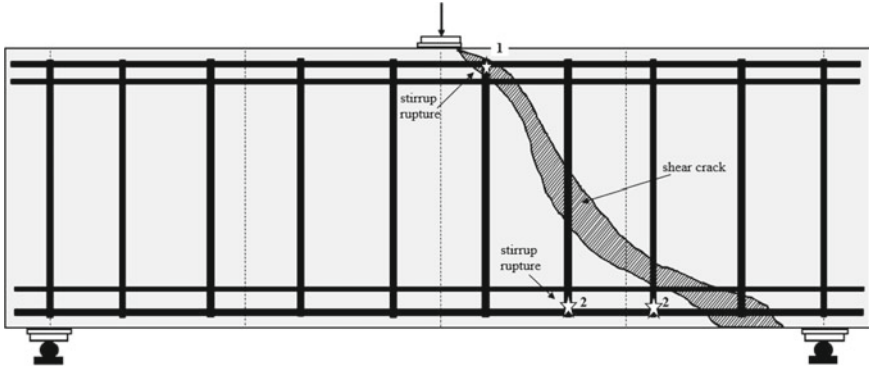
Failure crack of conditioned beam (beam 2) (north face of the beam)
